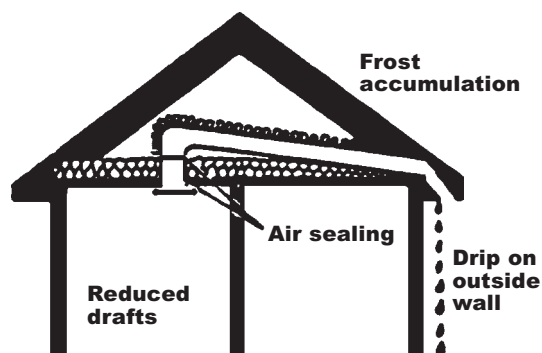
Exhaust fan vented ducting routed through a cold attic to the eaves allowed the condensation to drip down the outside of the building, rather than into the vented room.
